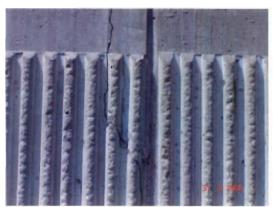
Hairline joint cracks east of Grant and south of river riverside.
